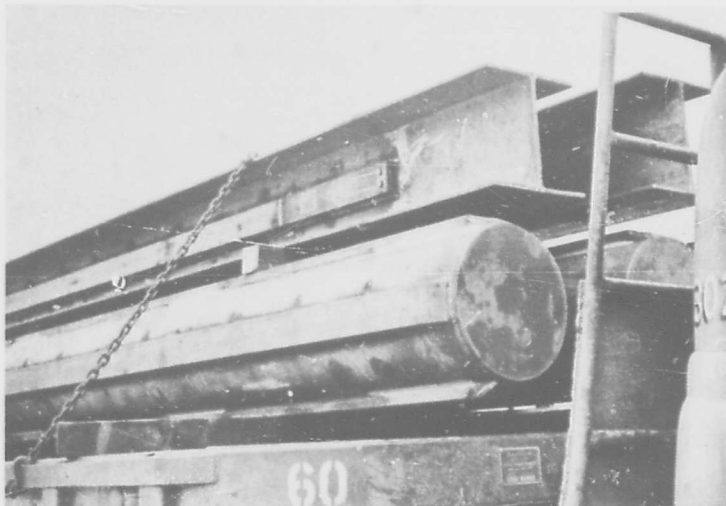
Steel Pipe and H-Piles Showing Channels for Protection of Instrumentation
